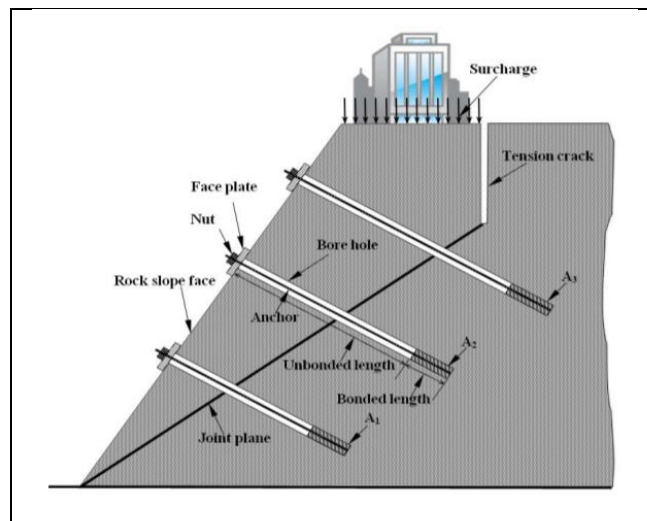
A single-directional anchored rock slope (Hossain, 2011)
